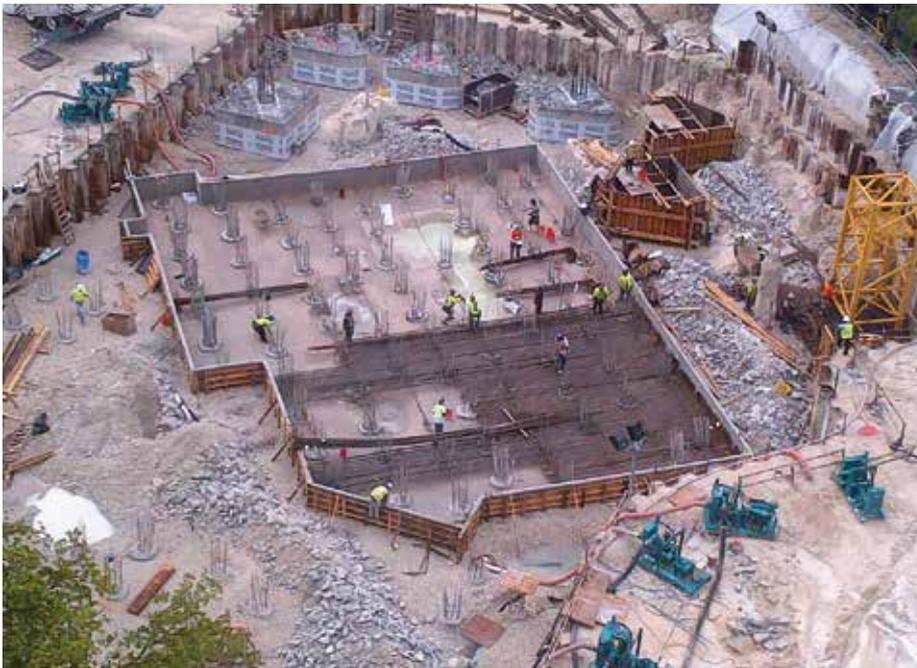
North tower core pile cap being laid out (Source: DeSimone Consulting Engineers, PLLC)
